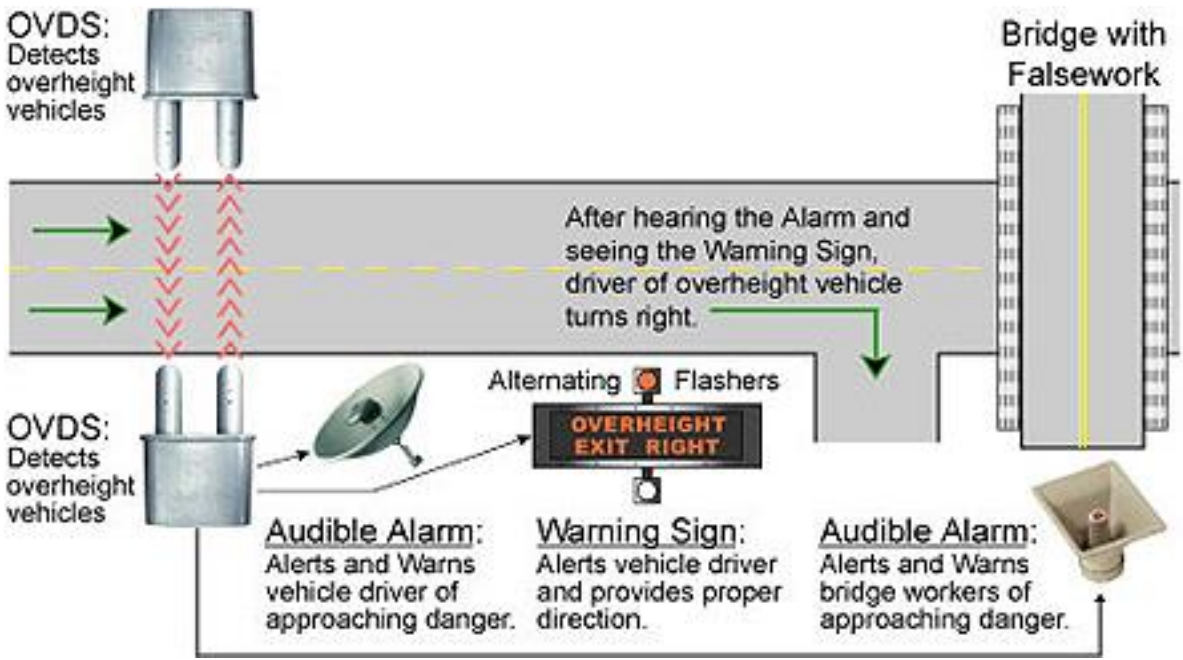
Typical Overheight Vehicle Detection System Installation.
